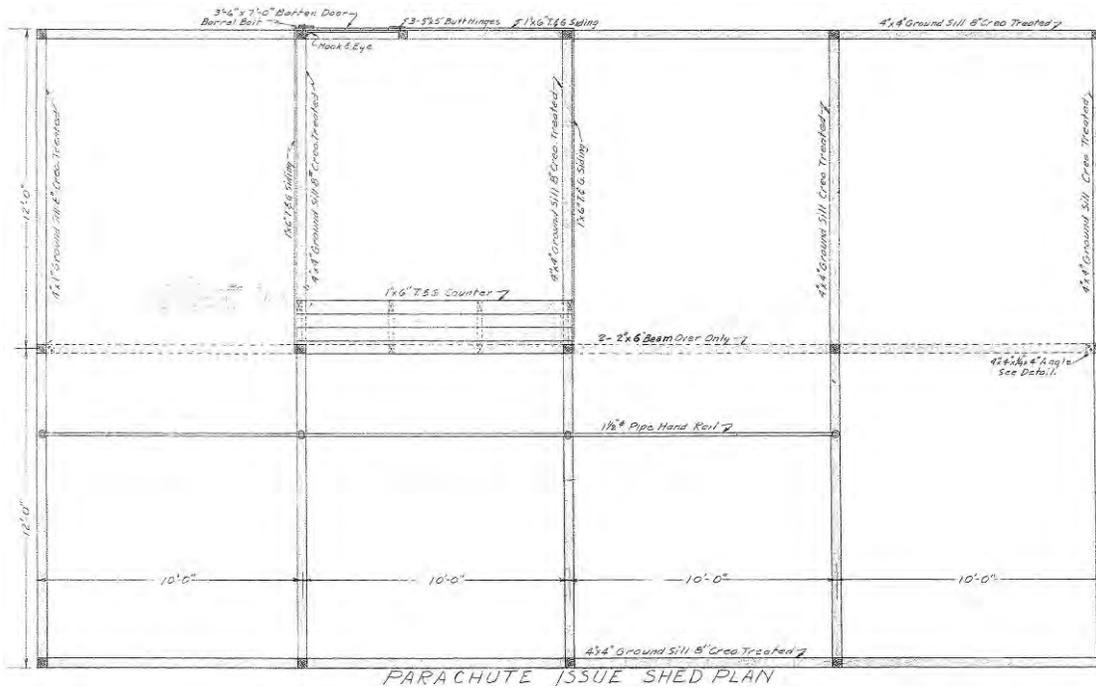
Parachute issue shed plan, Fort Bragg, NC, June 1949 (standard drawing 28-09-01 sheet 4 of 8; training aids, parachute issue shed and sand table, Fort Bragg, NC; 6 June 1949).
